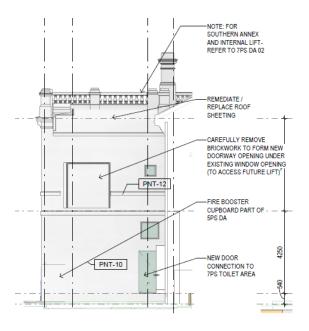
Eastern elevation proposed (Source: Architectural Drawing No. AR-DA1-2001, Rev C)
